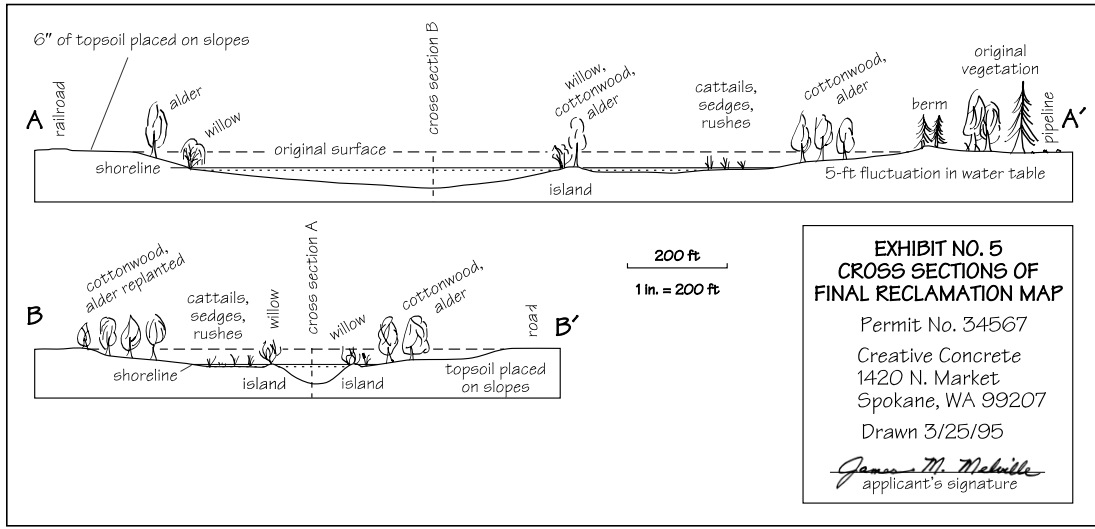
Cross sections for the final reclamation plan of the mine shown in Figure 1.4. The types and placement of vegetation and the slope of the pond banks are shown. (Modified from Norman and Lingley, 1992. Not to scale; this map has been reduced to fit on the page.)
